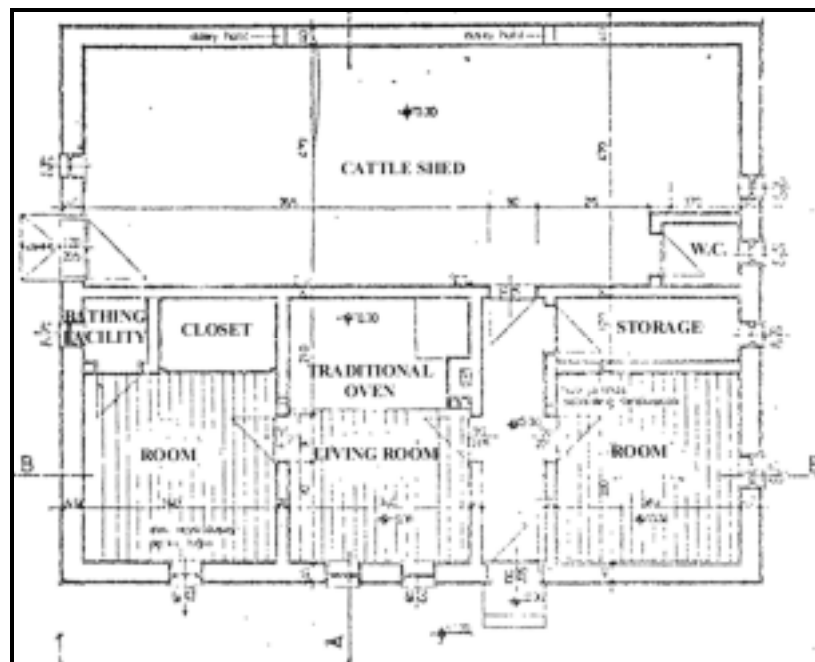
Plan of PDH erected in Kirkdikme Village.
